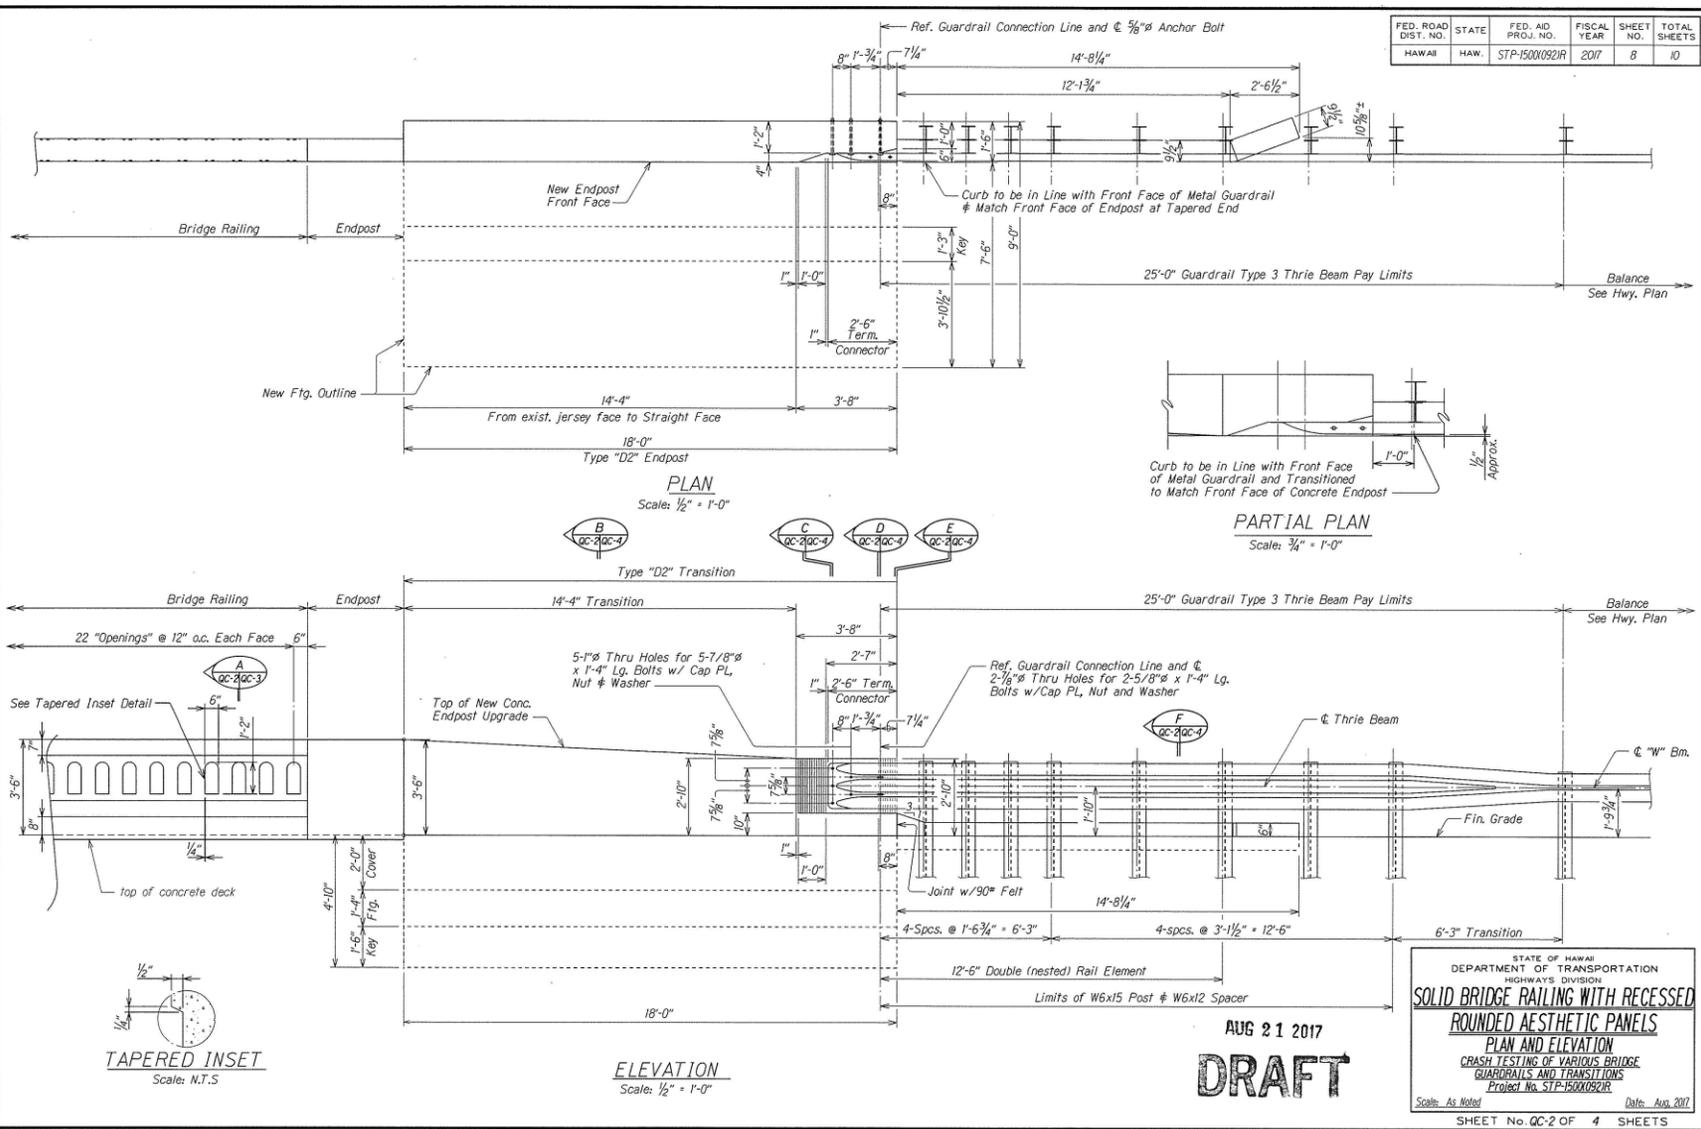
HDOT AGT to 42-in. Tall Bridge Rail Details
